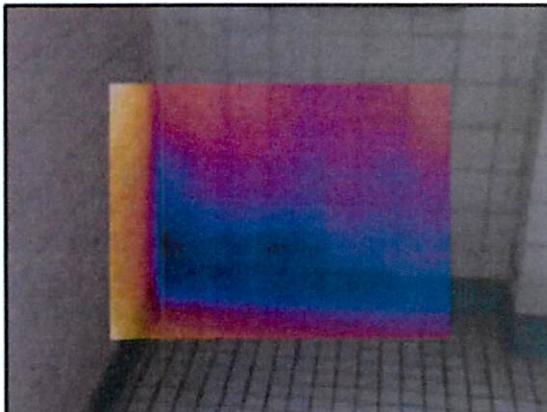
South wing restroom, shower area, evidence of residual moisture in wall system as viewed through IR camera
